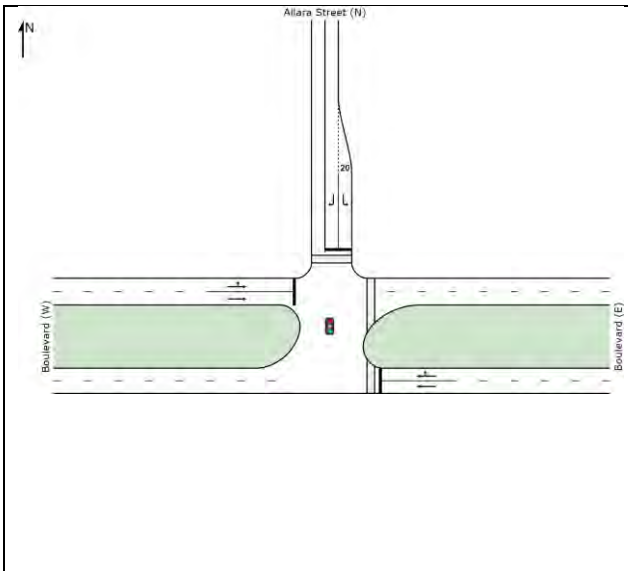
UDS Fesibility Design Parkes Way Boulevard – Allara Street Intersection
